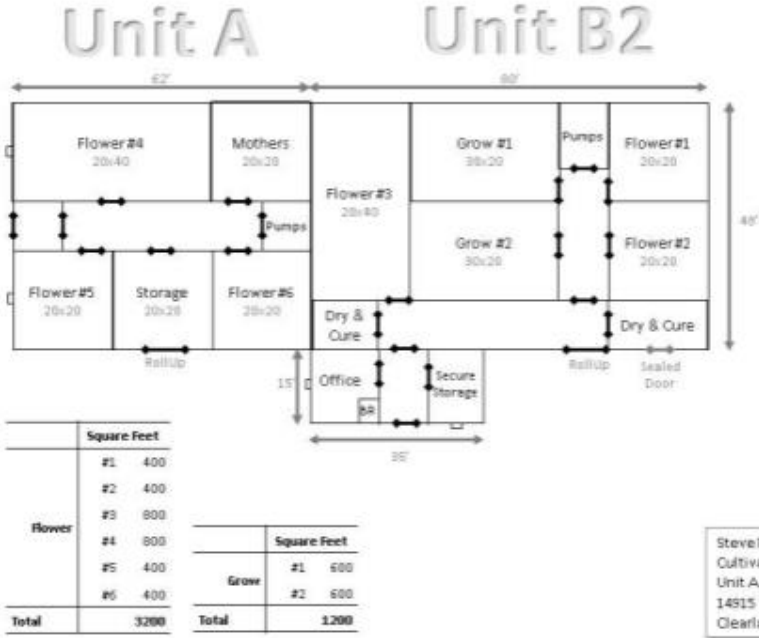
# EXHIBIT A – SITE PLAN AND INTERNAL LAYOUT
